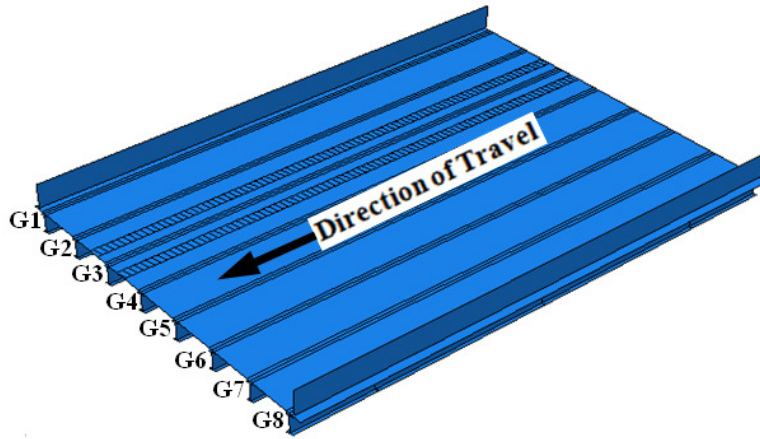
Finite Element Model of Composite Steel Girder Bridge.
